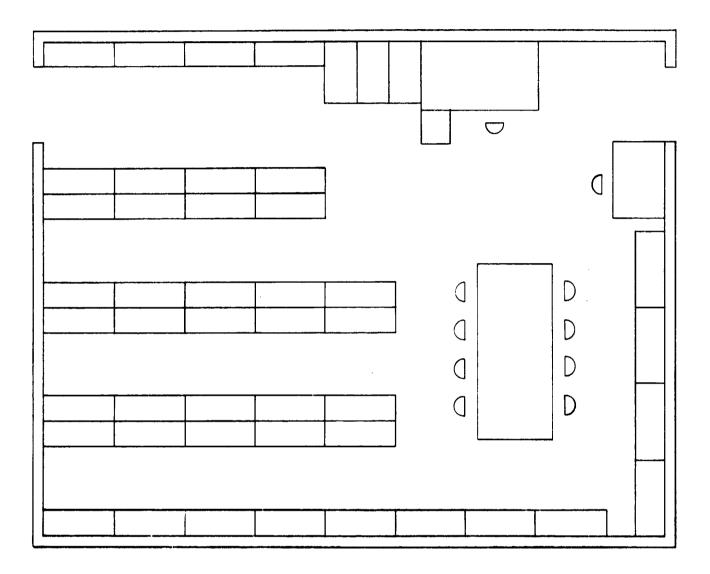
CHEMISTRY LABORATORY LIBRARY - REMODELING PLAN #2
